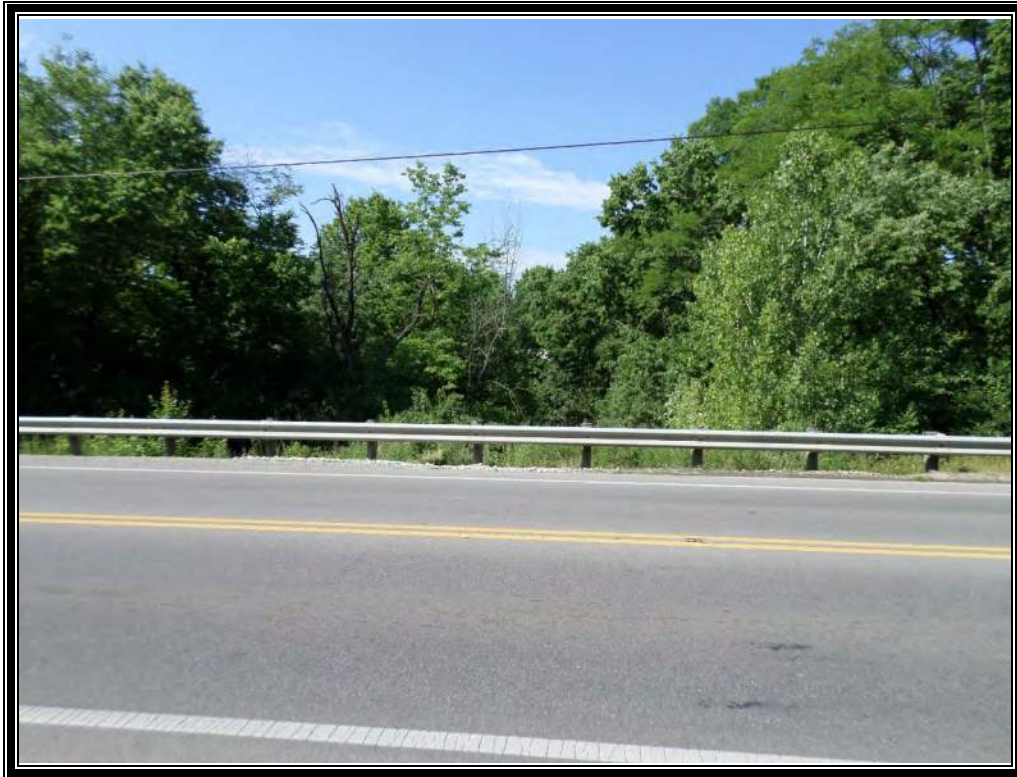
(6/14/16): Westerly view across Dublin Road. Roberts Millikin Ditch enters the site from beneath Dublin Road.
